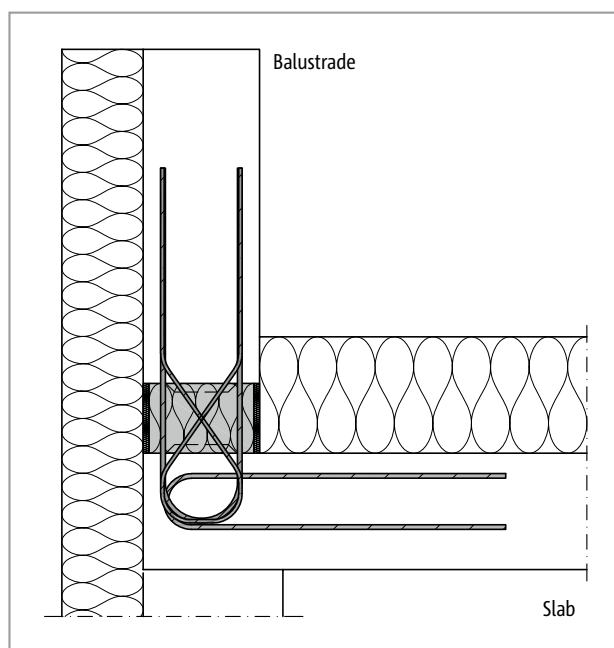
Schöck Isokorb® XT type A: Connection to a balustrade (XT type A-MM2)
